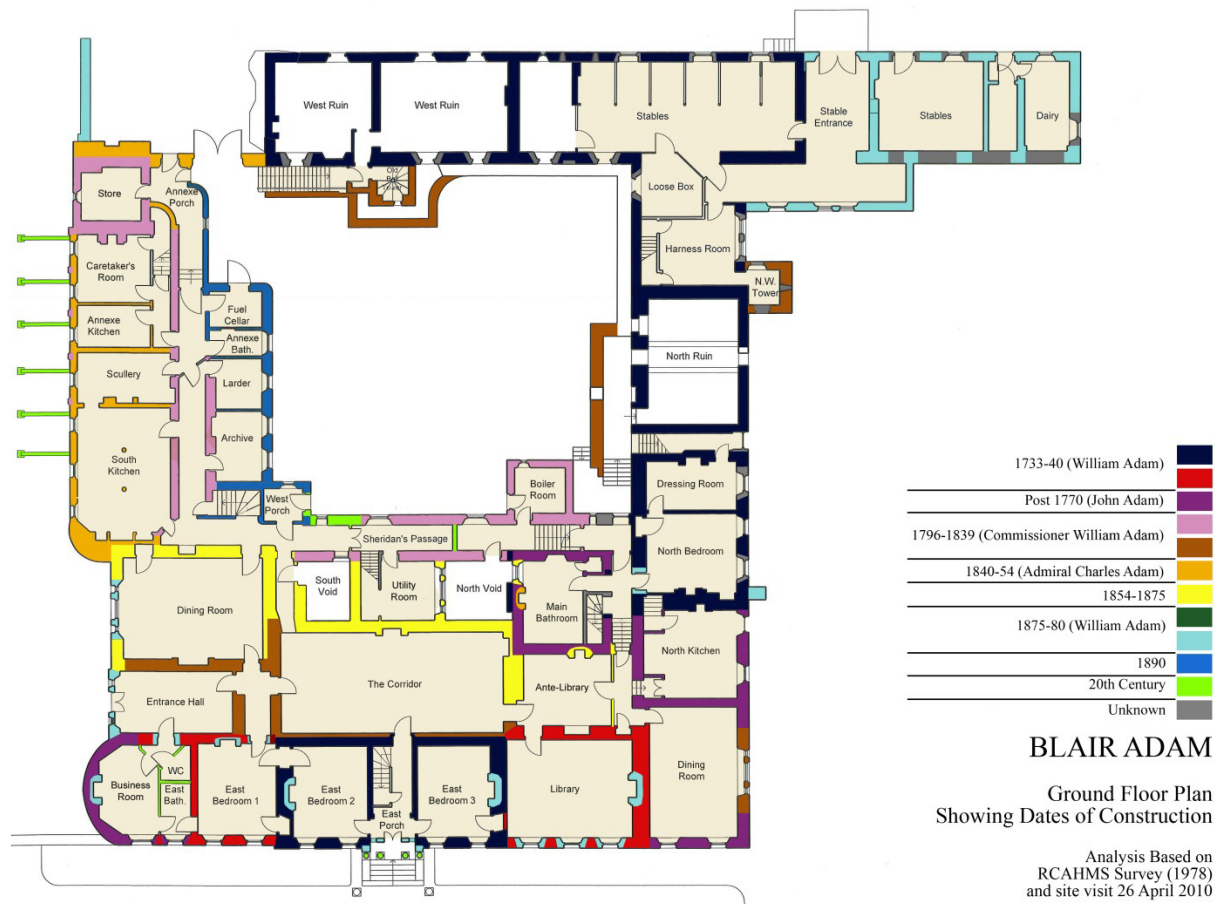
Blair Adam - phasing plan at ground floor level (north to right) – after RCAHMS/Addyman Archaeology
